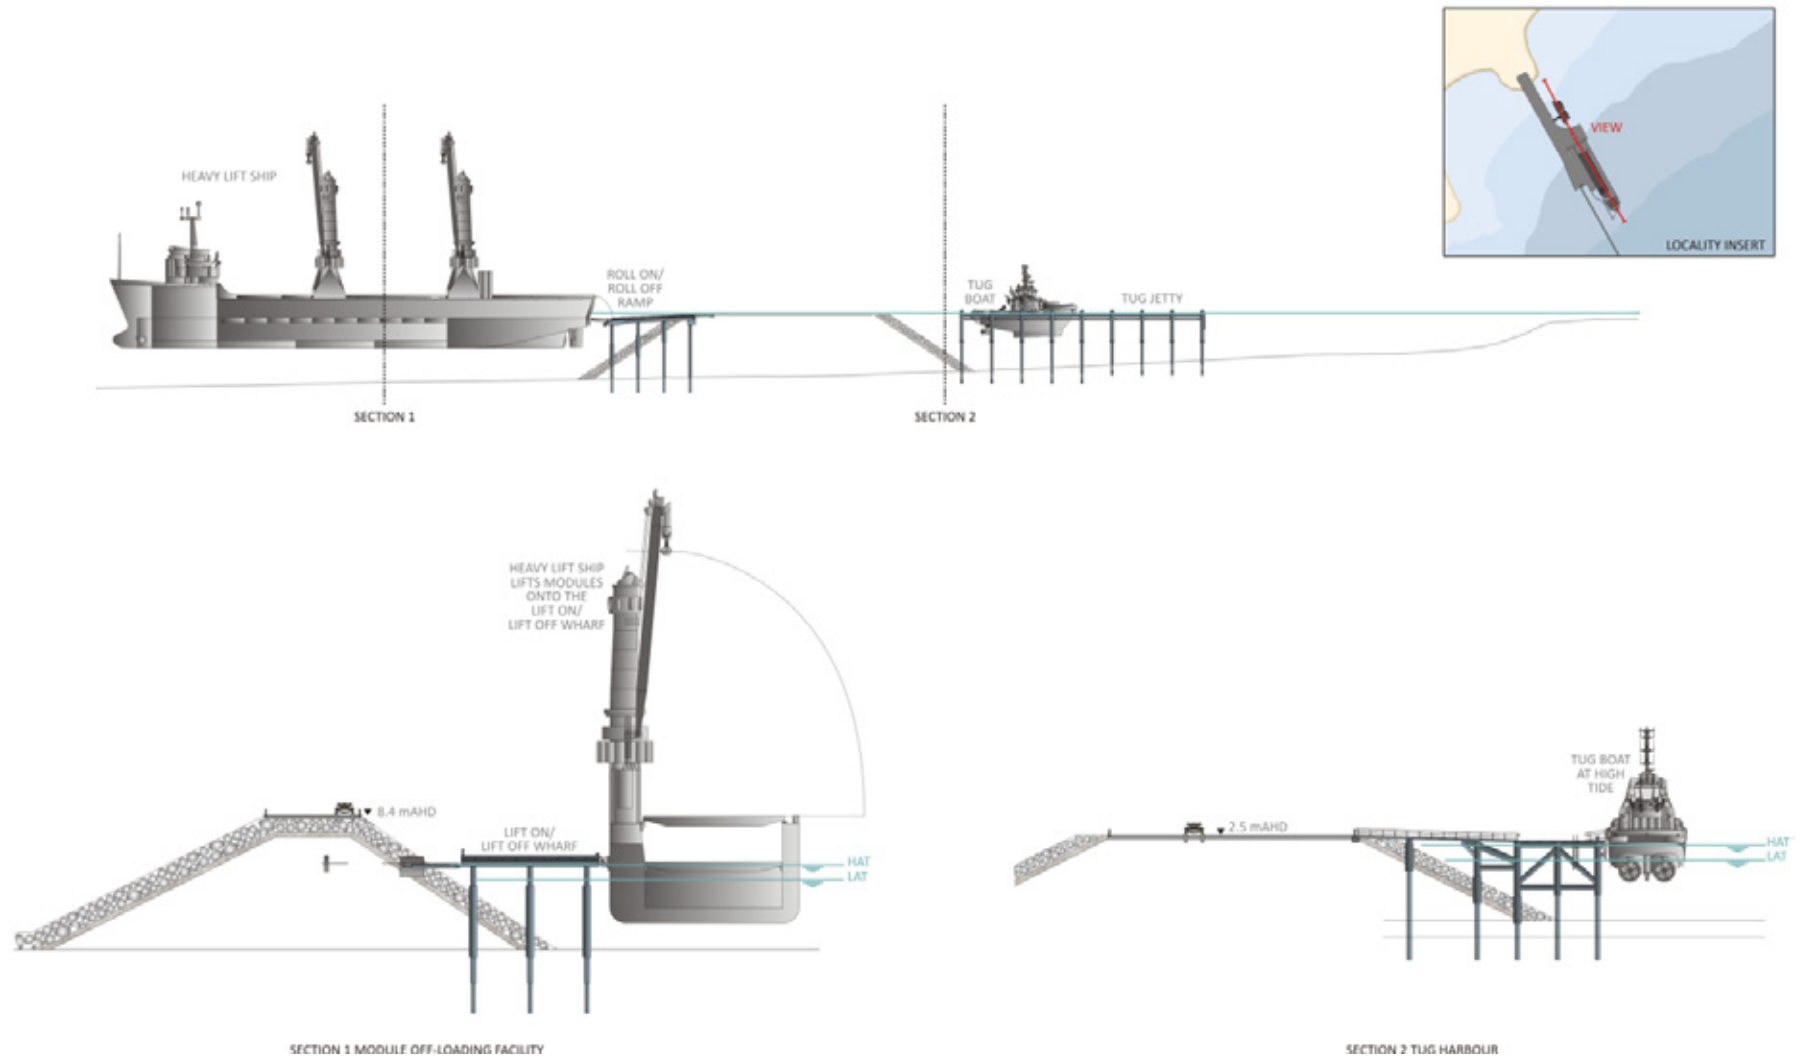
Tug Harbour and Module Offloading Facility Cross Section
